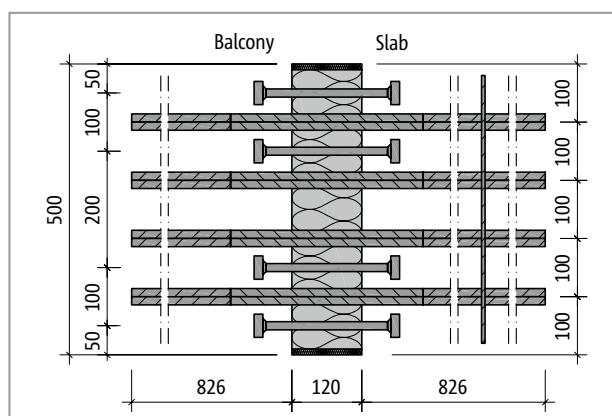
Schöck Isokorb® XT type Q-P-VV9: Product layout
